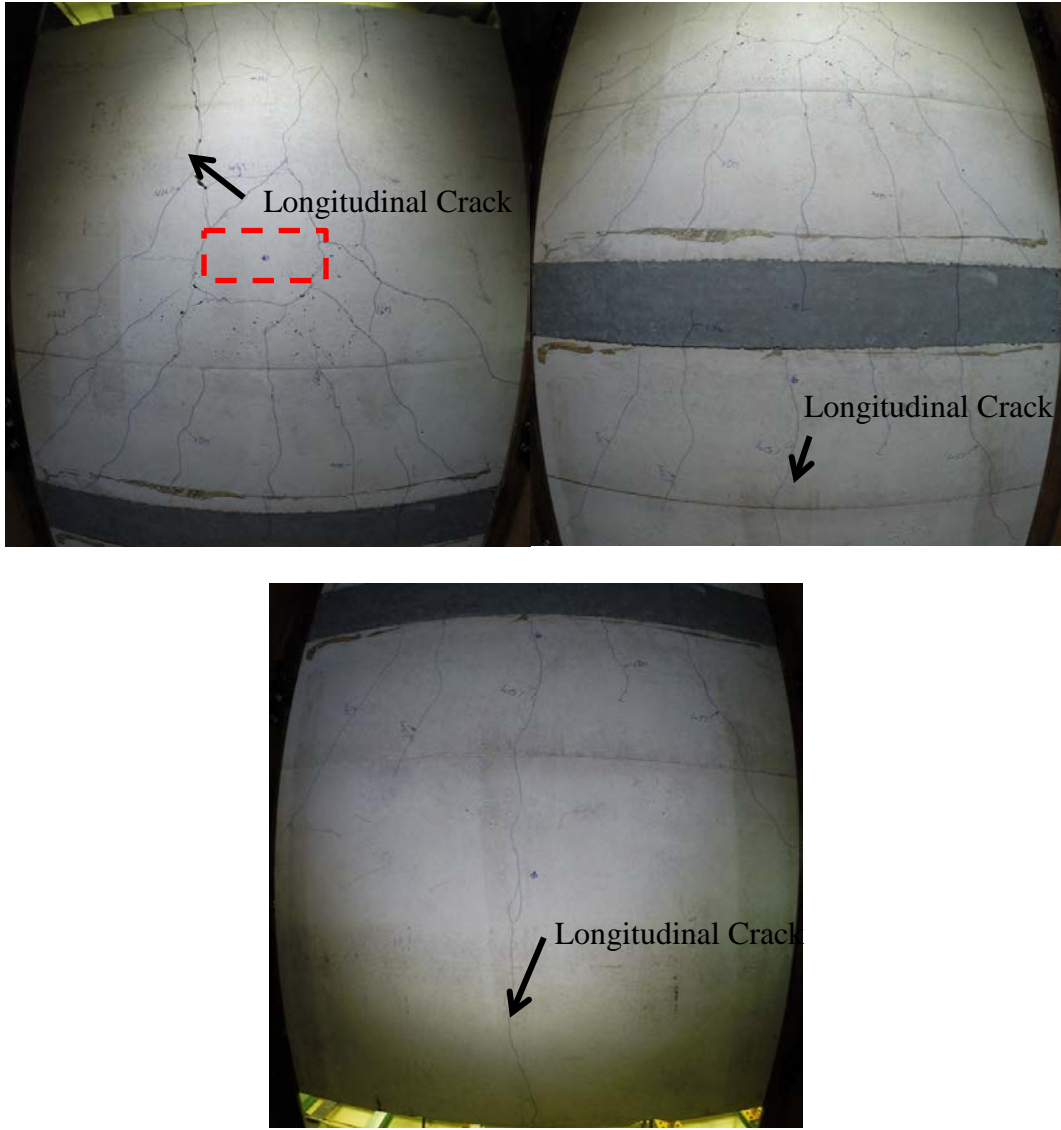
RB-3: Underside of slab after fatigue loading. (Top left: slab loaded adjacent to panel, Top Right: closure strip, Bottom: panel loaded in centre)
